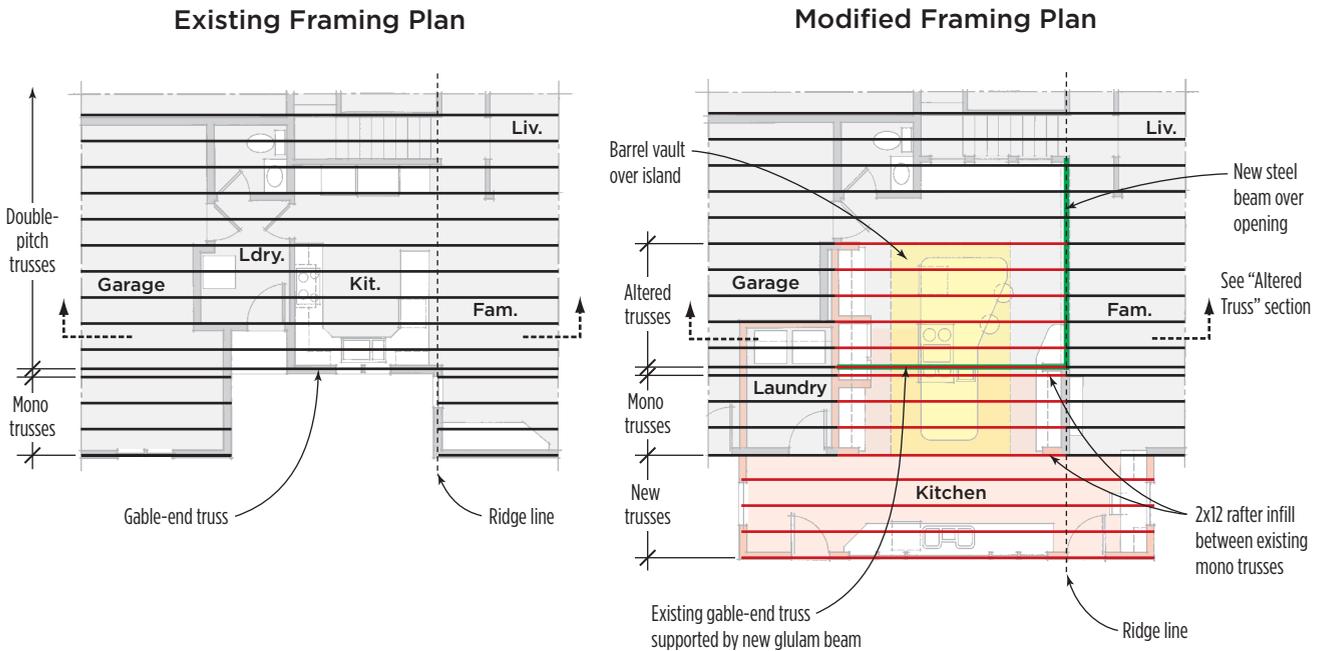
The existing common trusses spanned 64 feet and bore on the outer walls of the building. Space was created for a vaulted ceiling by reframing the sections of the bottom roof chords over the existing kitchen and carrying the vault into the new framing above the addition (illustration, above and next page). The engineered plan called for creating new bearing points at the existing garage wall and at a new steel beam installed over the opening to the family room (detail photo, next page).
